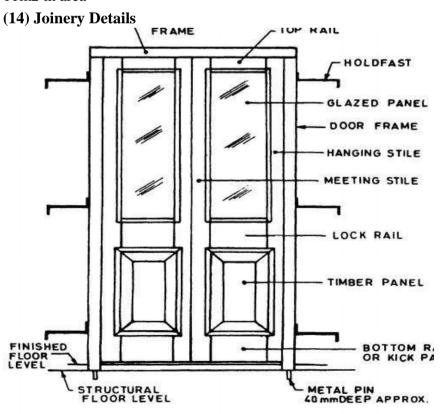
TYPICAL ILLUSTRATION OF DOUBLE PANELLED DOOR WITH TIMBER AND GLAZED PANELS
